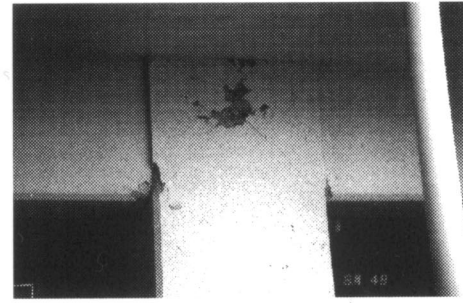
Severe compression failure on the interior joint of an 11-story SRC building at the 3rd floor, although the cracks were not too wide.
